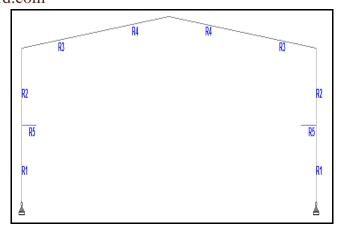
Typical Section OF PEB- AISC/LRFD Frame
